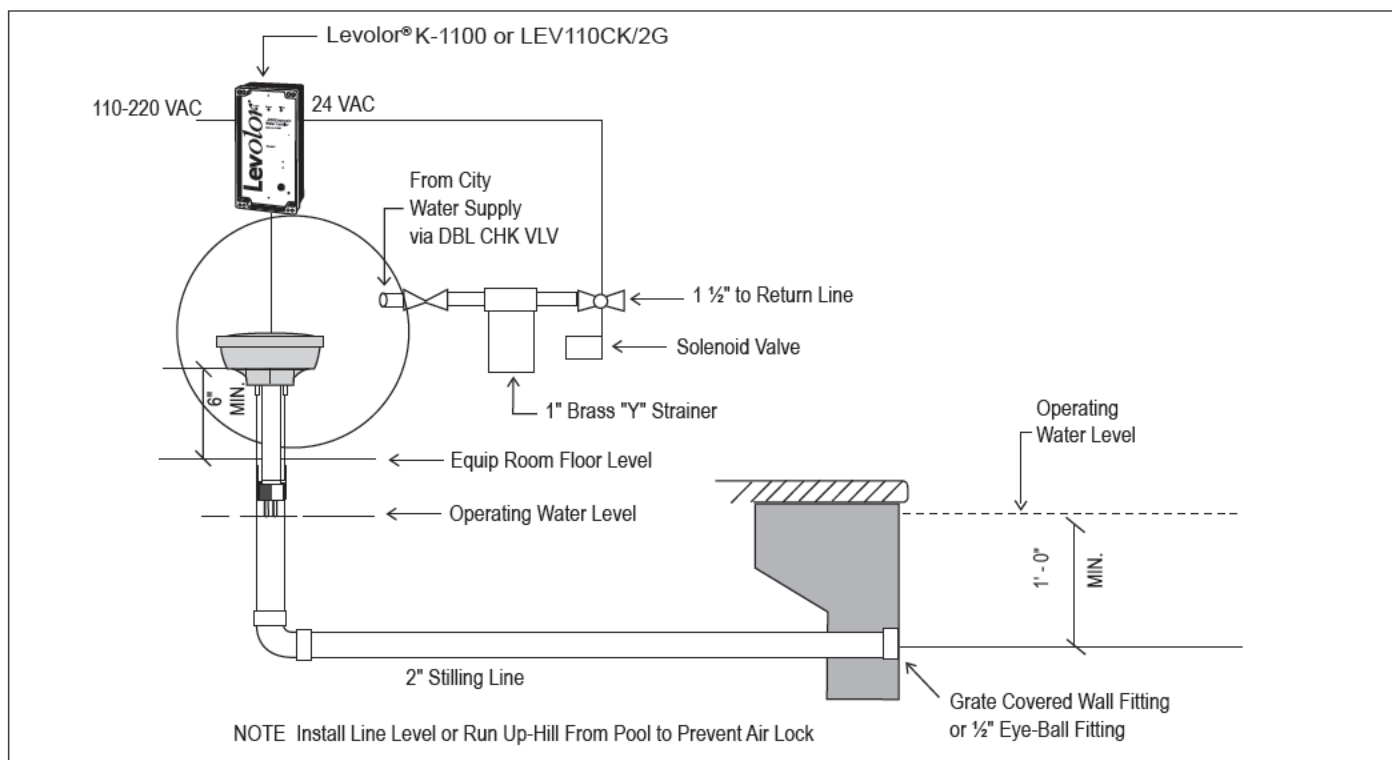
Slip Sensor in Static Pipe Installation in New Pool
